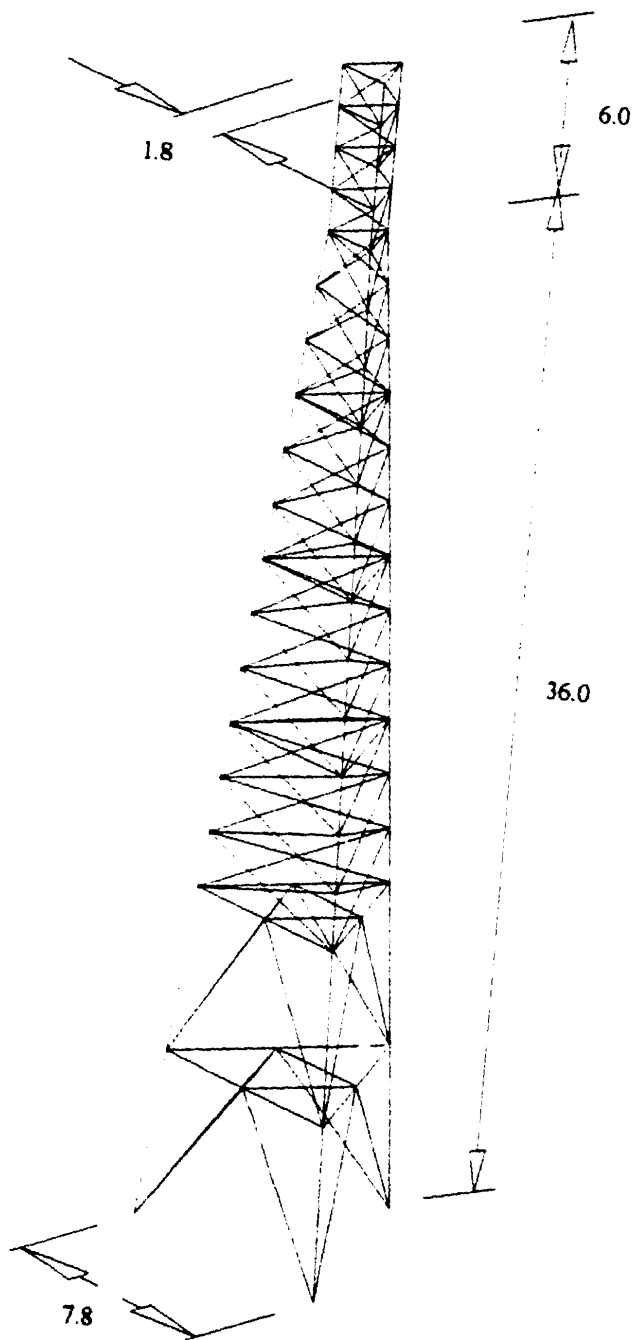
Layout of tower TC2 (dimensions are in m)
